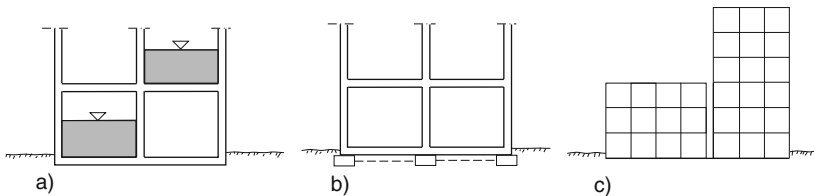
Frame structures with shallow foundation on a plate (a) and on strips (b); neighboured structures with shallow foundation (c)
